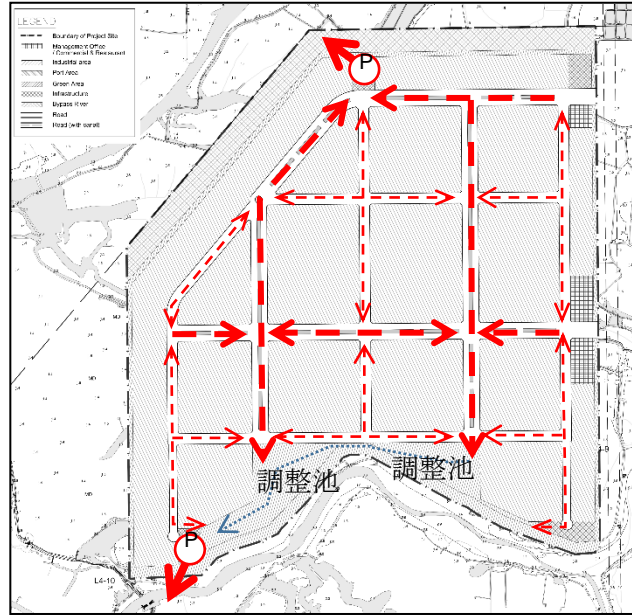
(3)-2 Rainwater drainage plan of General EZ
